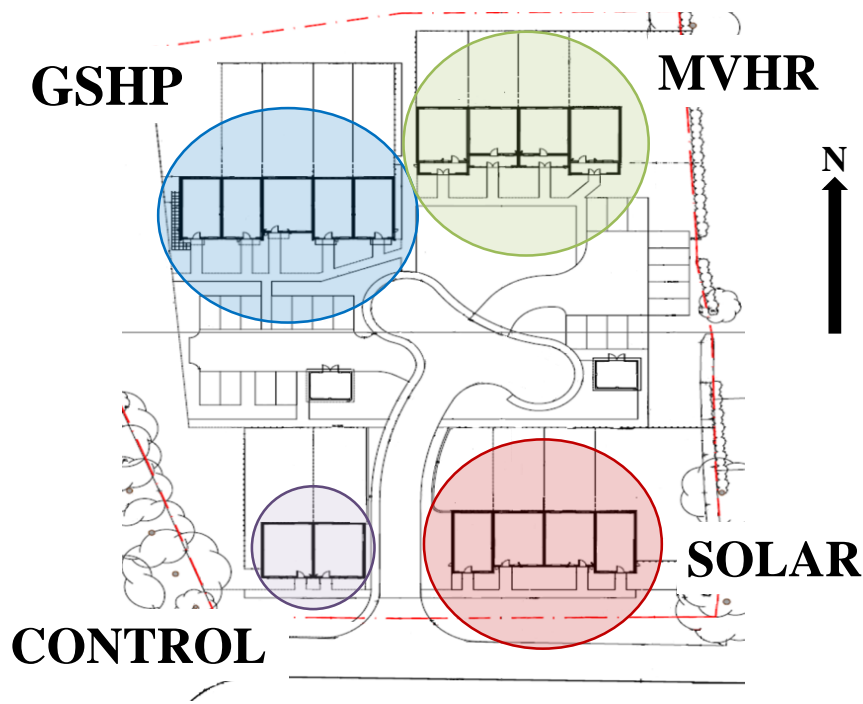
Case study site (Lingwood, UK) plan showing site layout and allocation of technologies to properties
